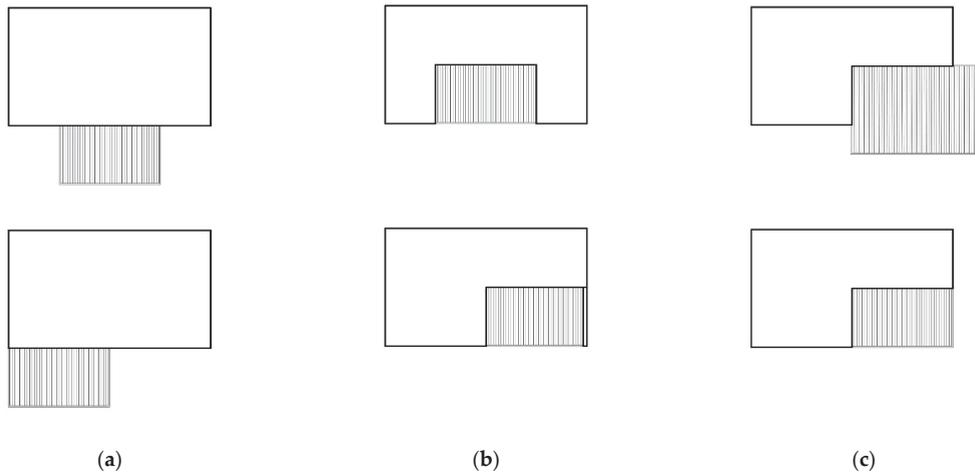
Extension in houses: (a) placed outside the building floorplan contour; (b) placed inside the building floorplan; and (c) placed in the corner (figure by the author).
